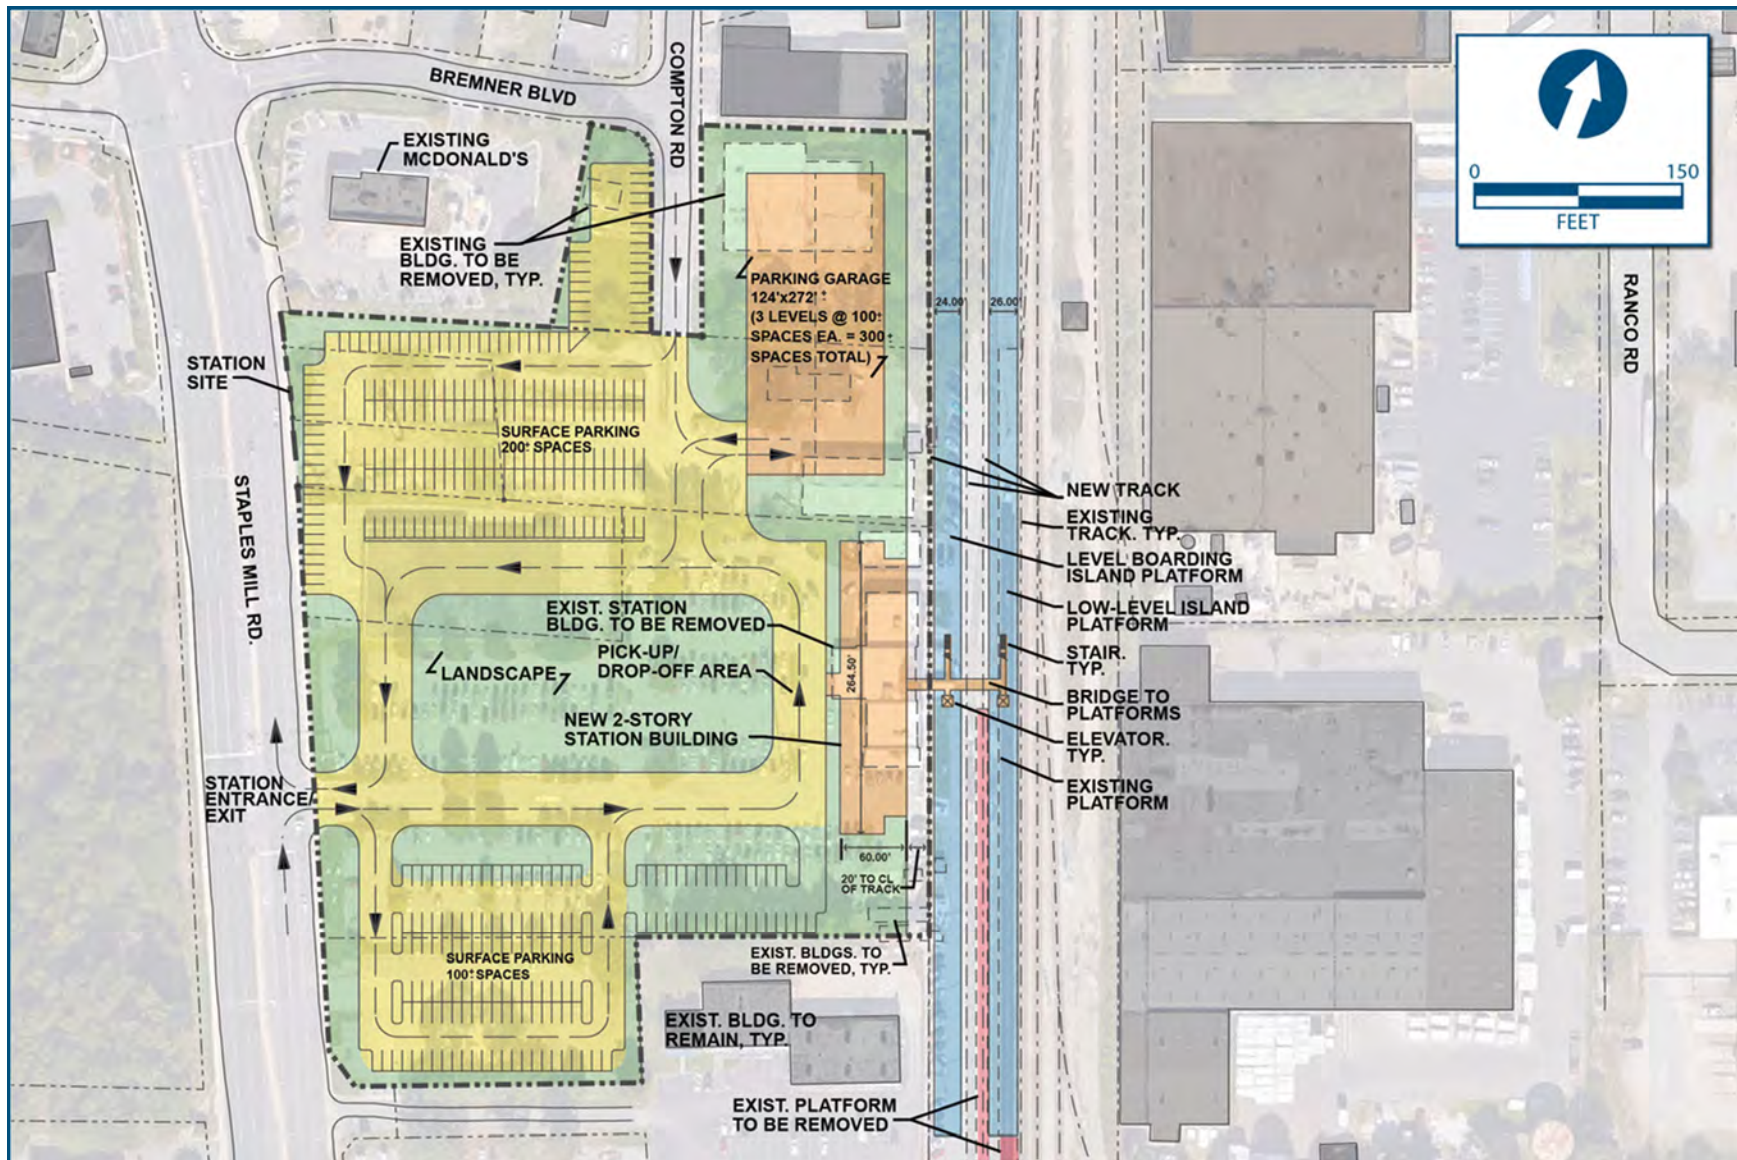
Staples Mill Road Station Improvements for Build Alternative 6E
